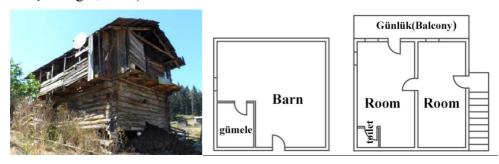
Karakız Highland Dwelling (Özdemir & Çelikoğlu, 2014), ground floor and first floor plan (drawn by the author)
